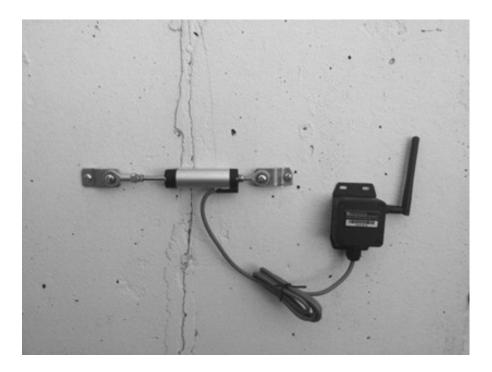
Crack meter installed in crack. Source: Resencys LLC
